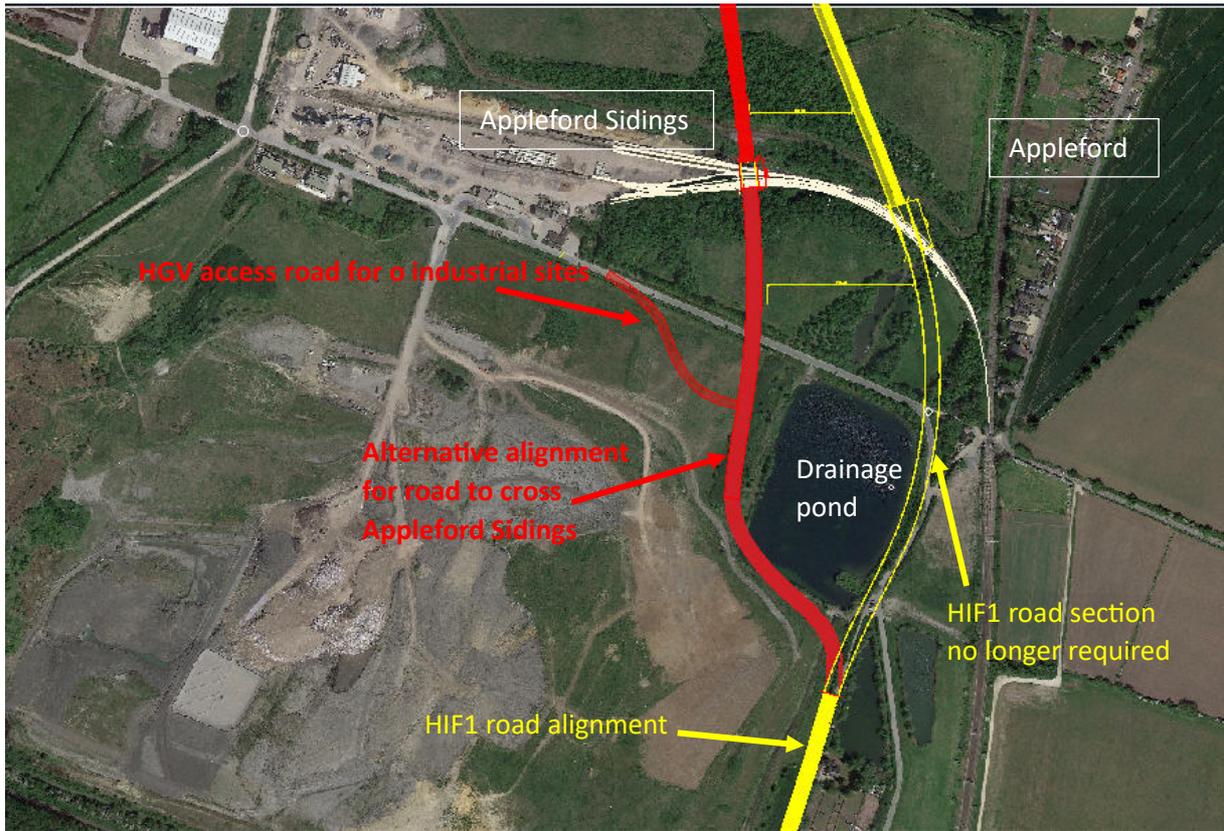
Alternative road position approaching the repositioned bridge crossing Appleford Sidings
